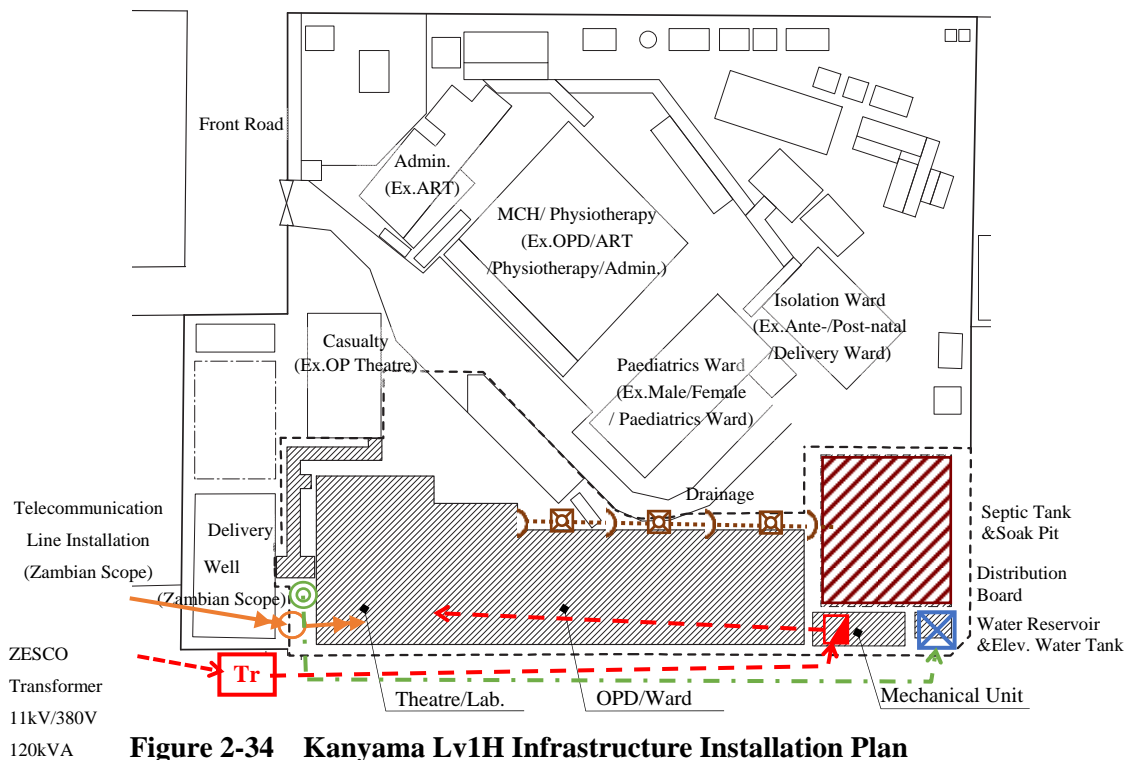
Kanyama Lv1H Infrastructure Installation Plan
